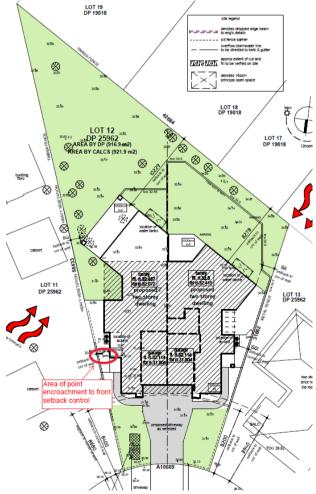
Site plan depicting area of side setback non-compliance (red circle)
